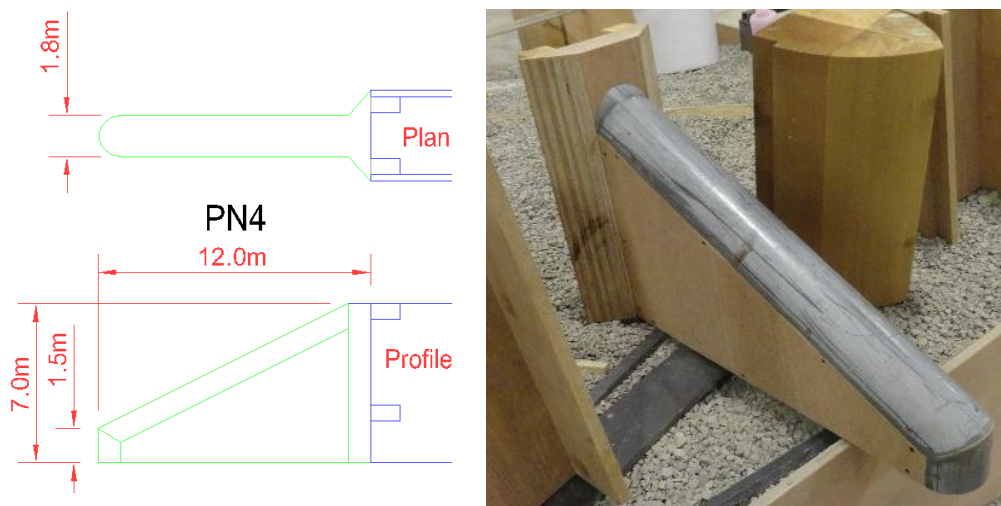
Pier Nose 4 design schematic and photograph before installation.
